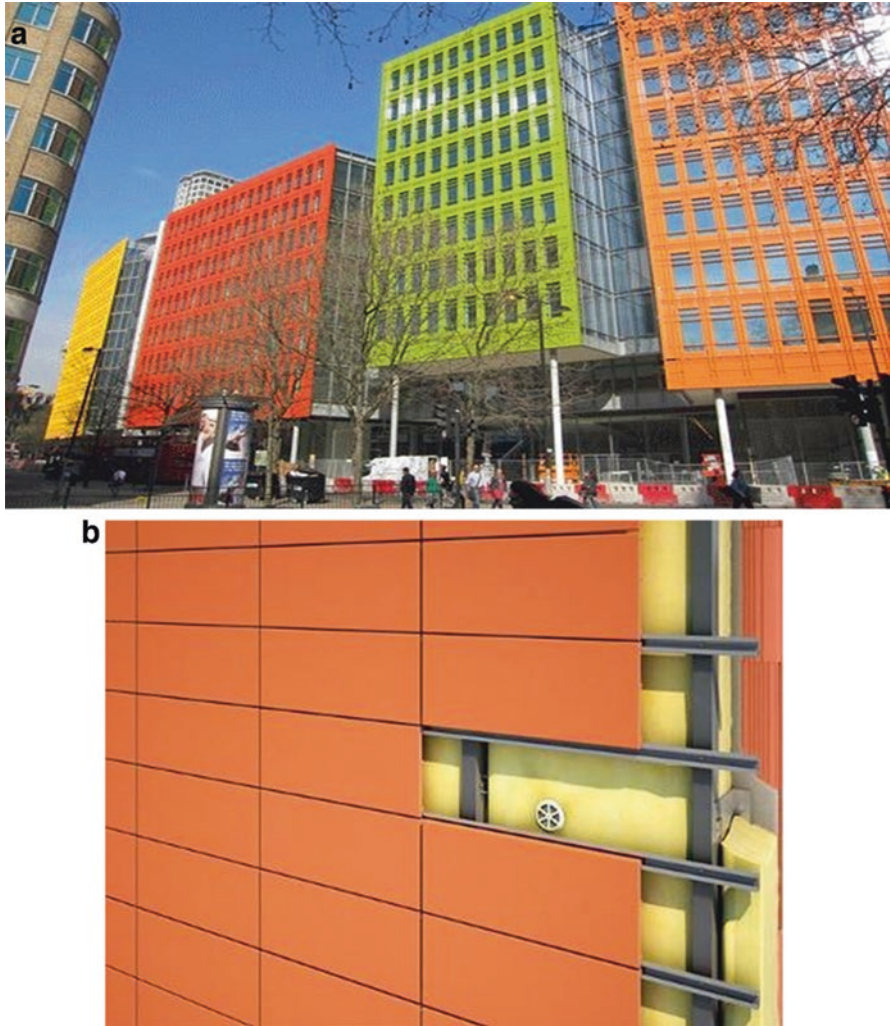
(a, b) Buildings in Berlin. Different aspects of ventilated façade design by Renzo Piano. Detail of brick solution
